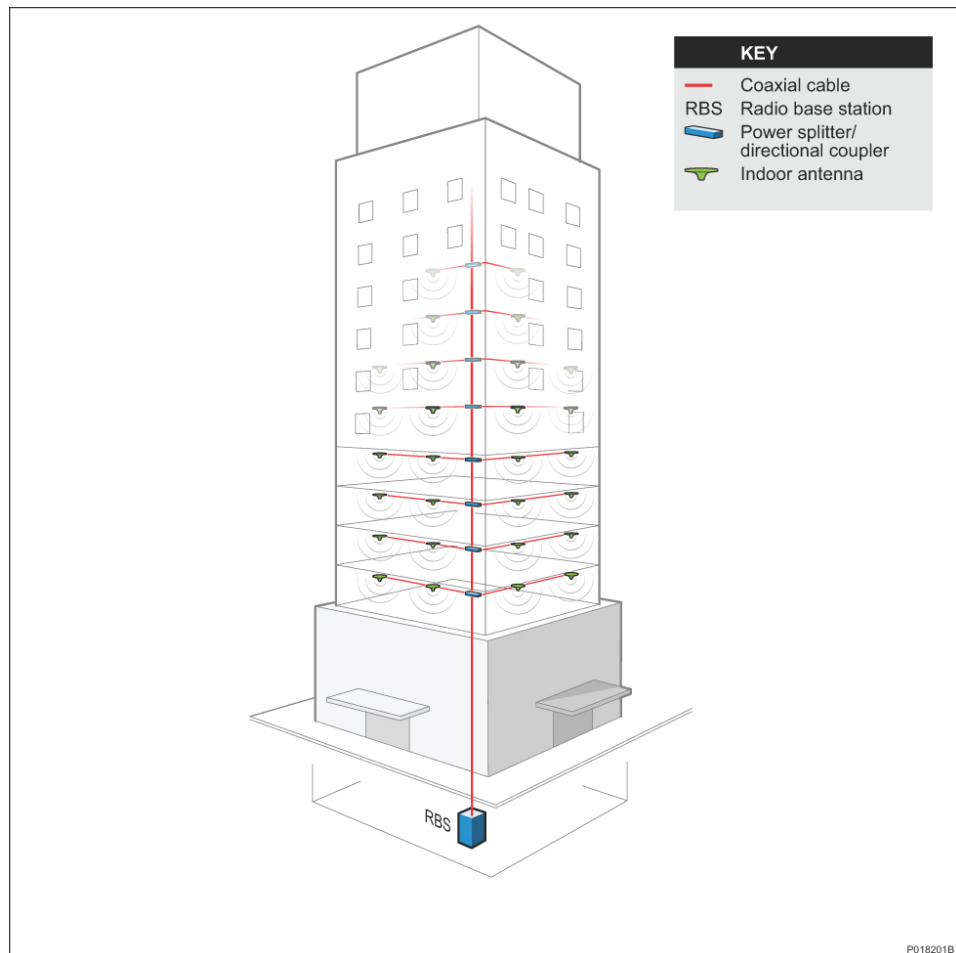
An in-building solution with a macro RBS connected to a passive coaxial distributed antenna system covering a large-size building.
